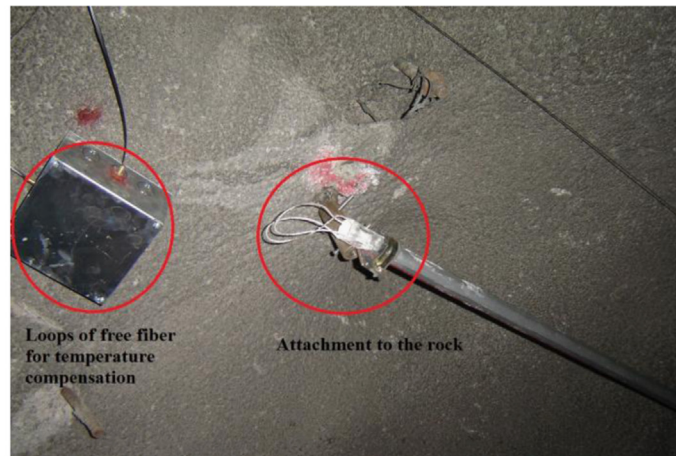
Tube sensors attached to tunnel sidewall and ceiling.
